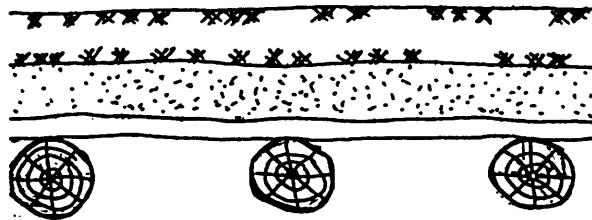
Traditional roof construction in the adobe building, drawing by author.
